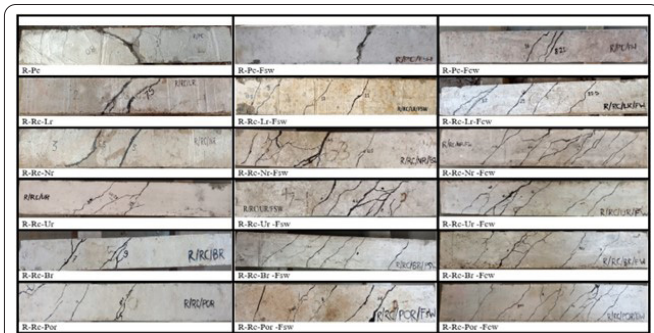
Cracks propagations of tested control beams specimens and specimens contained encased WWM wrapping patterns.
